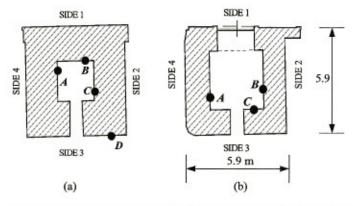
Torre Sineo: plan of the single and double flat-jack testing points at (a) foundation; (b) ground floor level
